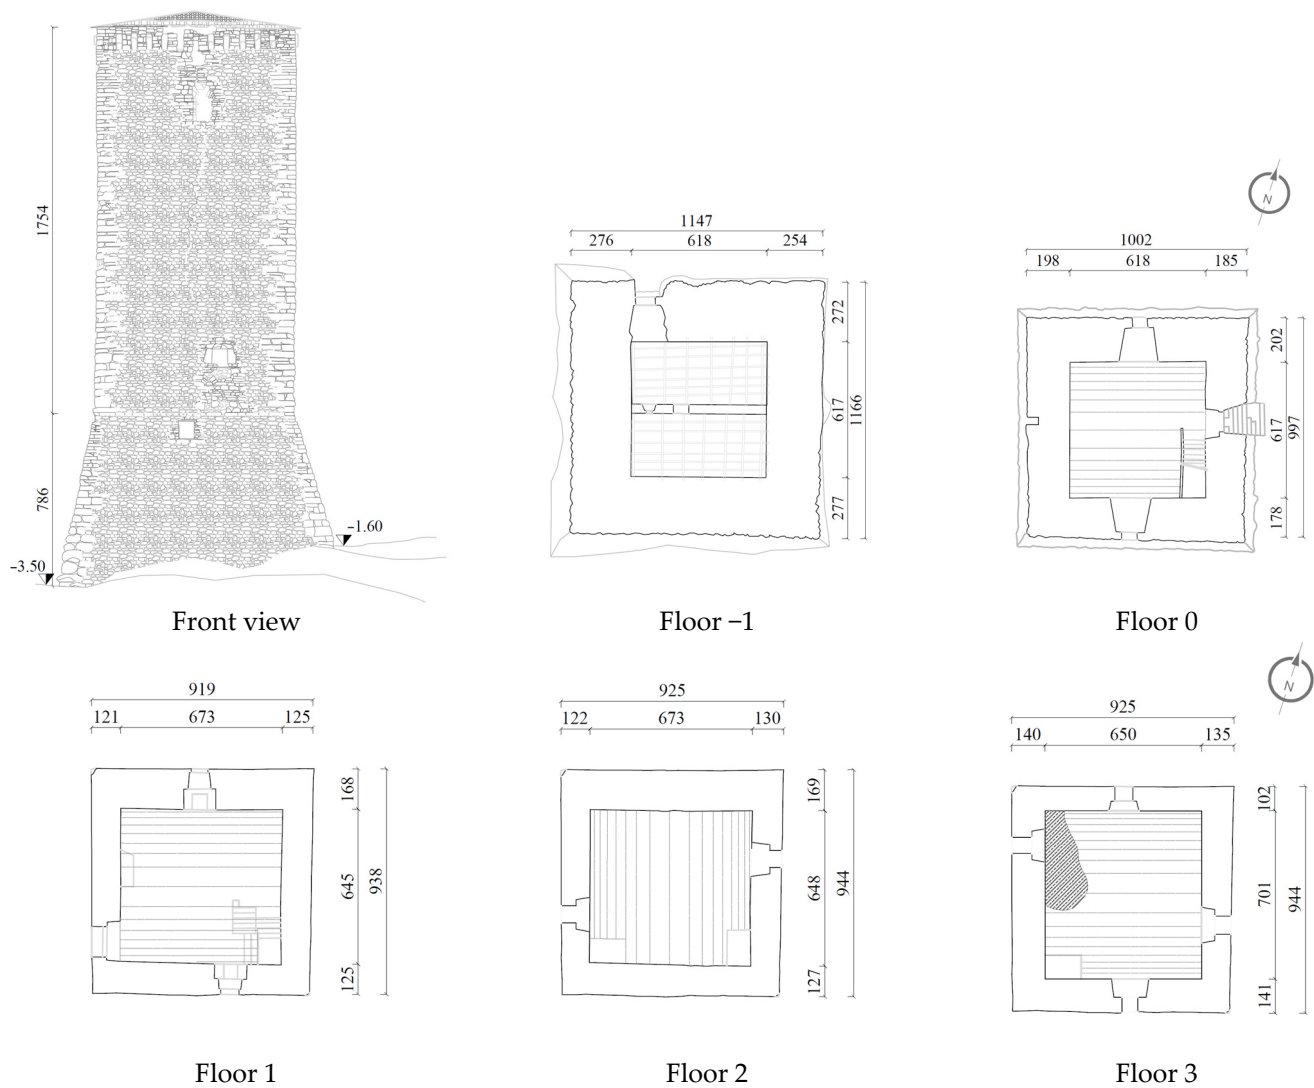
Front view and horizontal section of each floor (dimension in meters).
